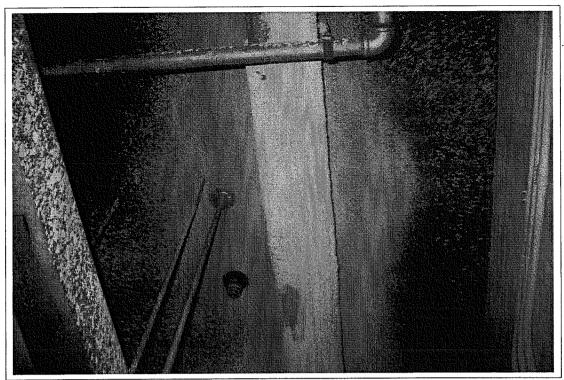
General view of fireproofing applied to I-beam with overspray on decking, HVAC duct work and hanger supports in the East wing, 2nd floor Telephone Closet
